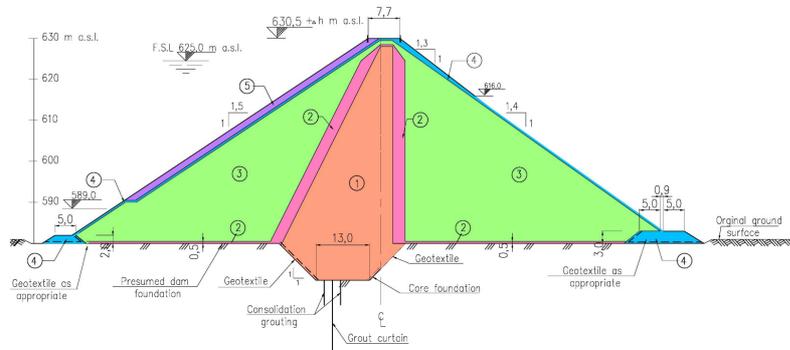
A typical dam section showing the essential features. (1) Core; (2) Filter; (3) Shell; (4) Slope protection; (5) Riprap. The core trench shown is limited to the west abutment only.
